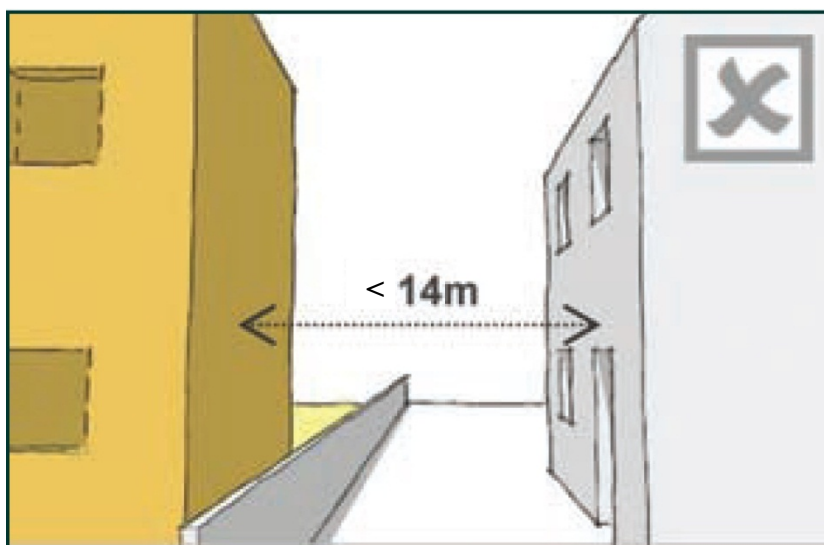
Distance of 14.00 metres between a protected window and a blank two-storey wall
